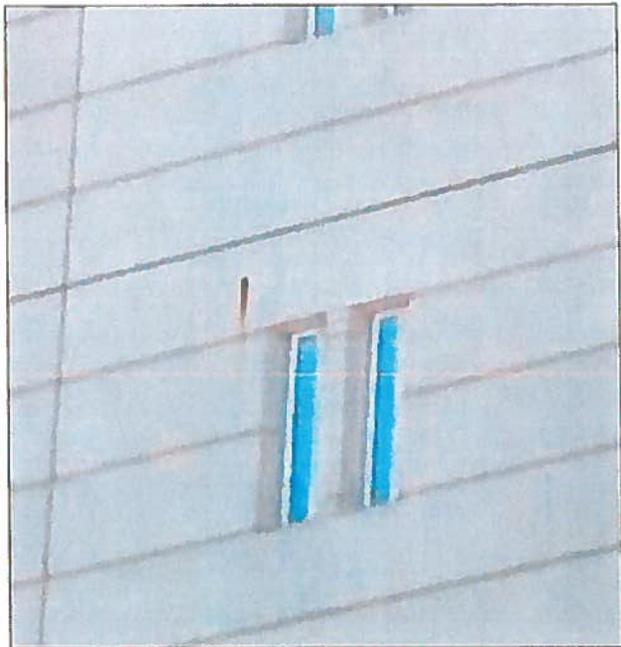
Rust stain (due to embedded steel) on precast wall panels.
